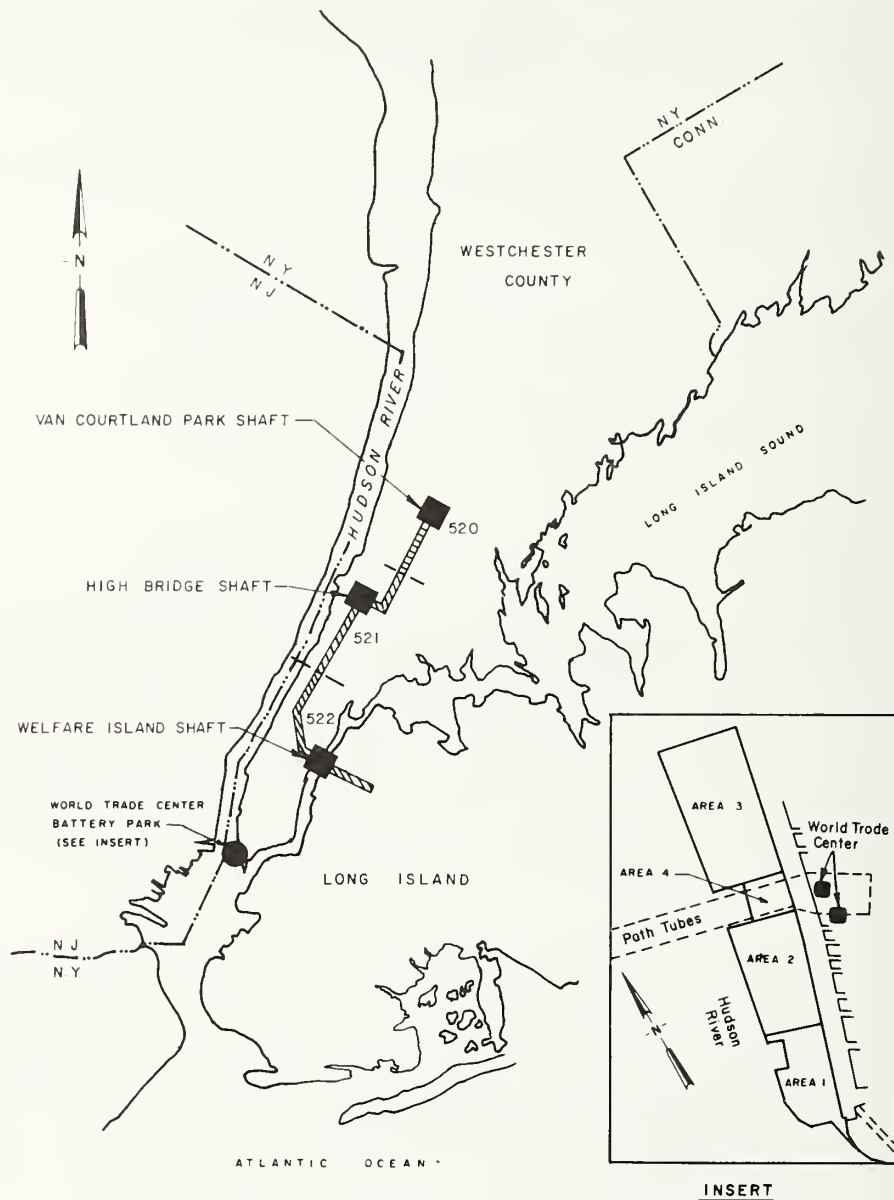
LOCATION PLAN - CITY WATER TUNNEL NO. 3
